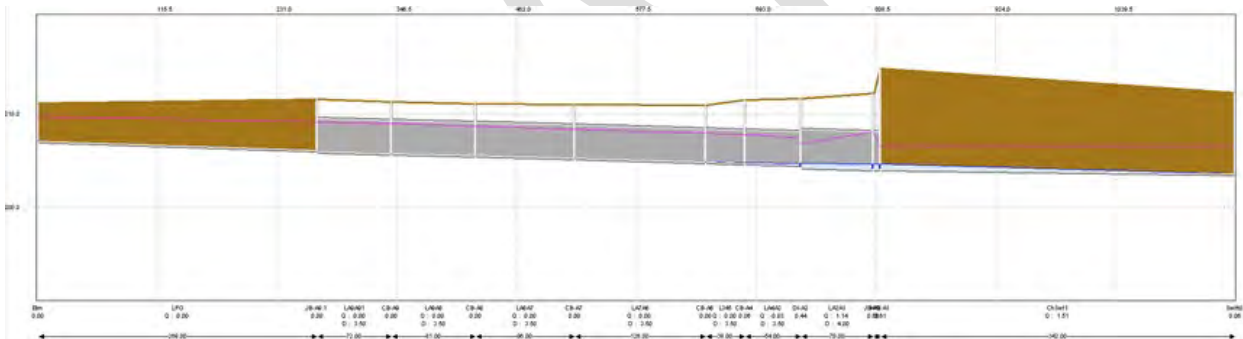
Proposed System from Post Office Ditch Fourth St Ditch Outlet
